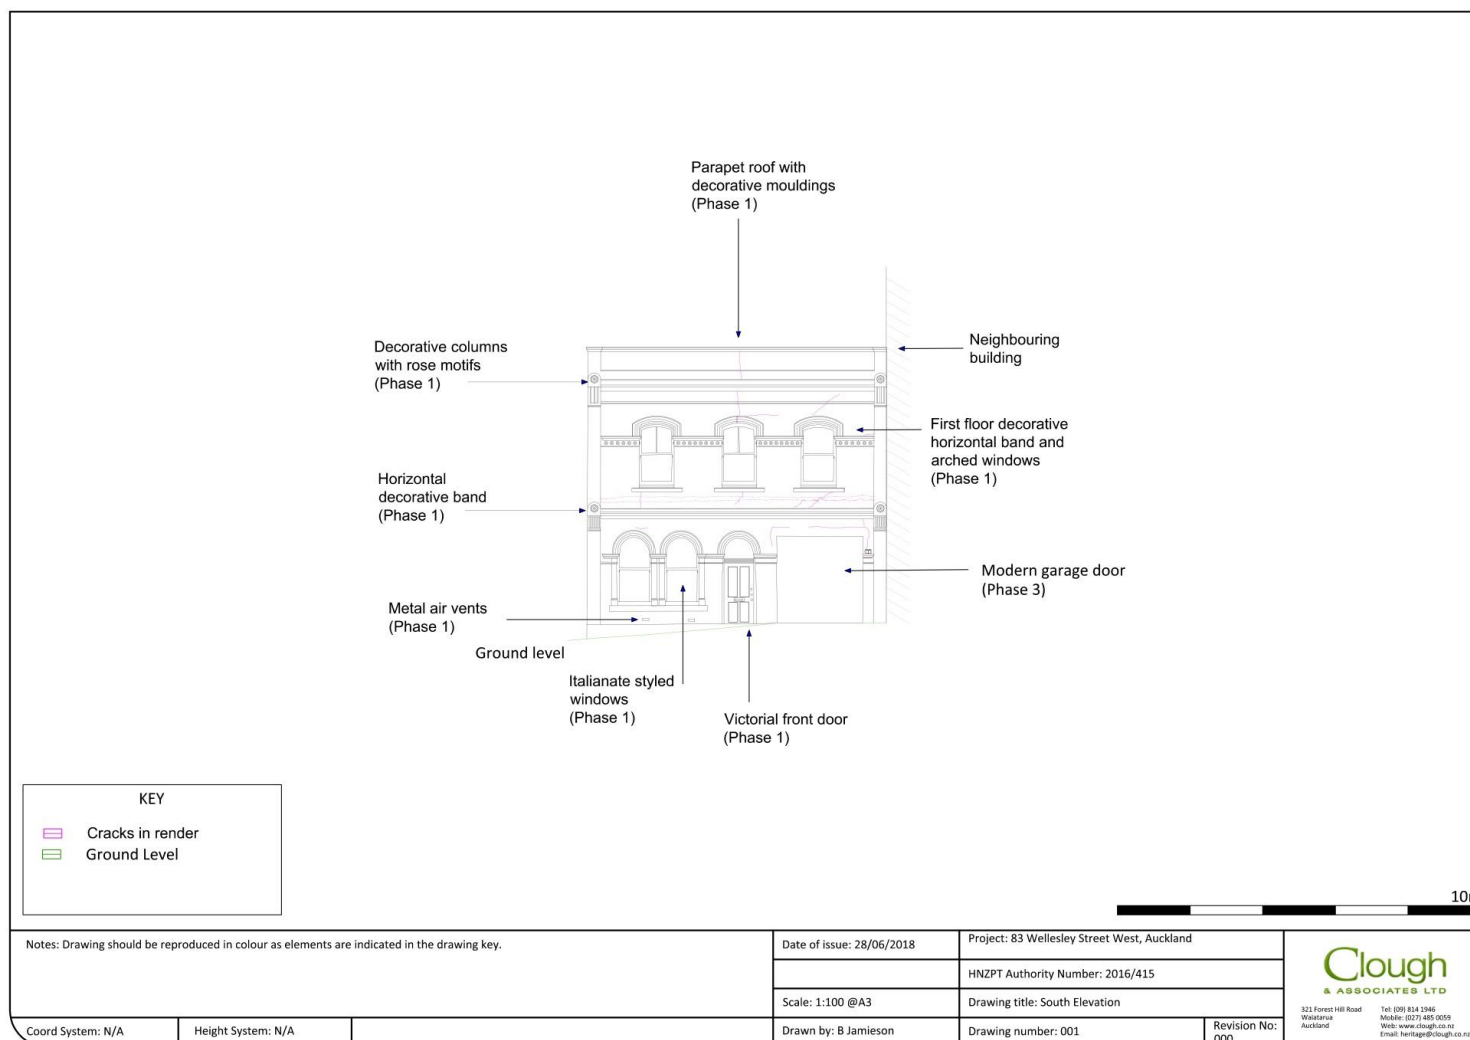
Front (south facing) elevation of 83 Wellesley Street West (source: Clough & Associates, 2015)
